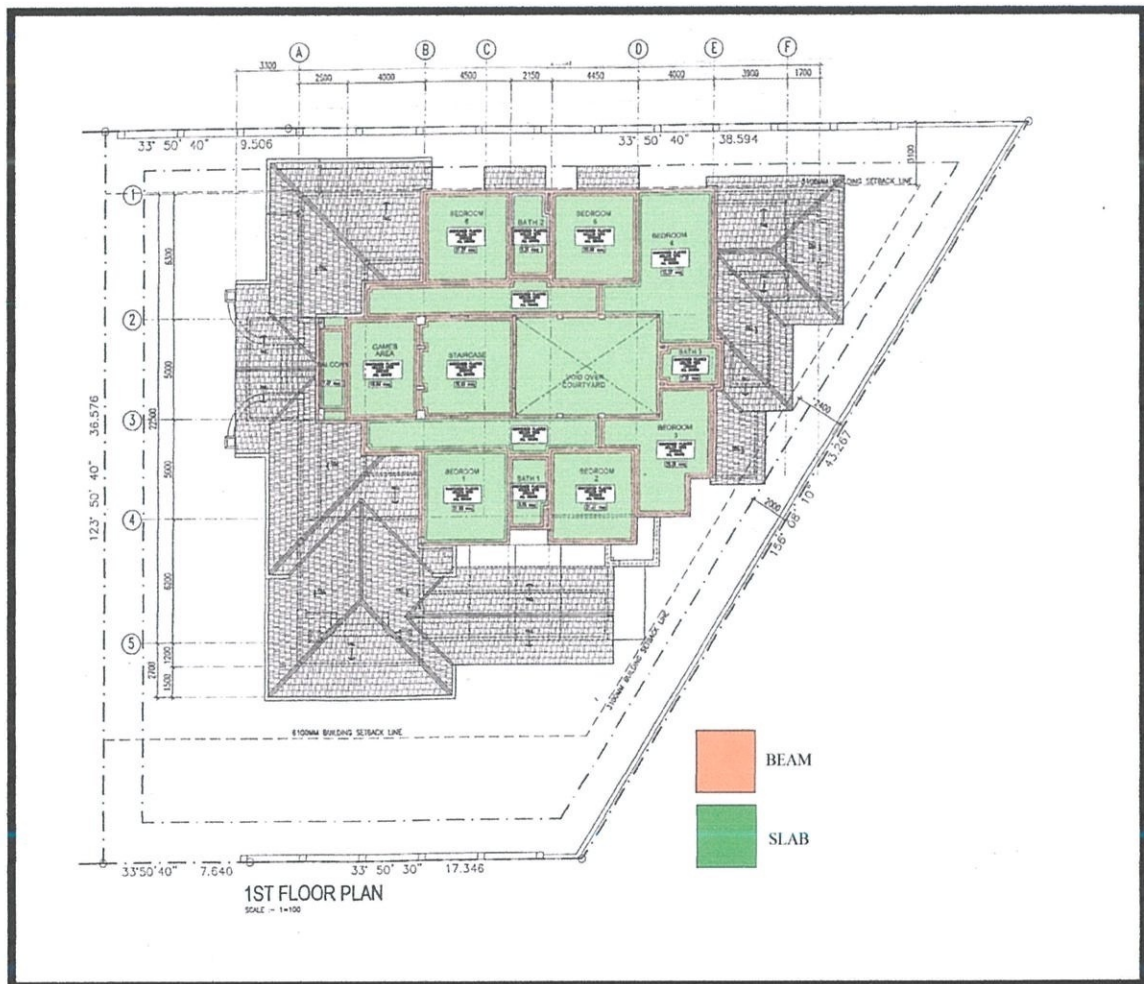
1st Floor Plan of the Hj. Maulud's bungalow Construction
